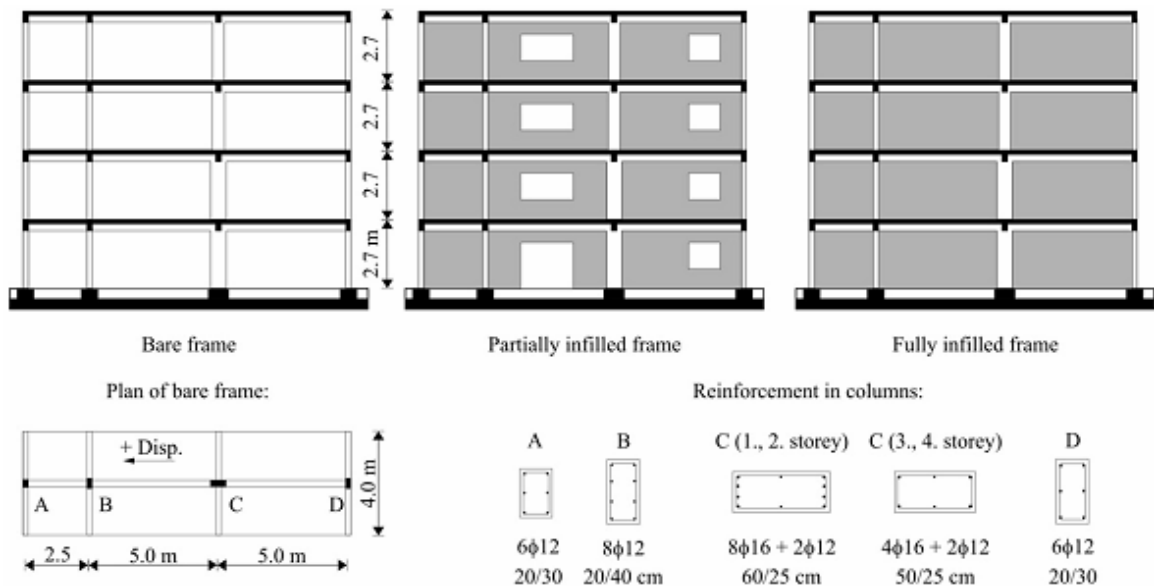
Layout of the frames and reinforcement details of the columns (Source: Dolšek and Fajfar, 2008)
